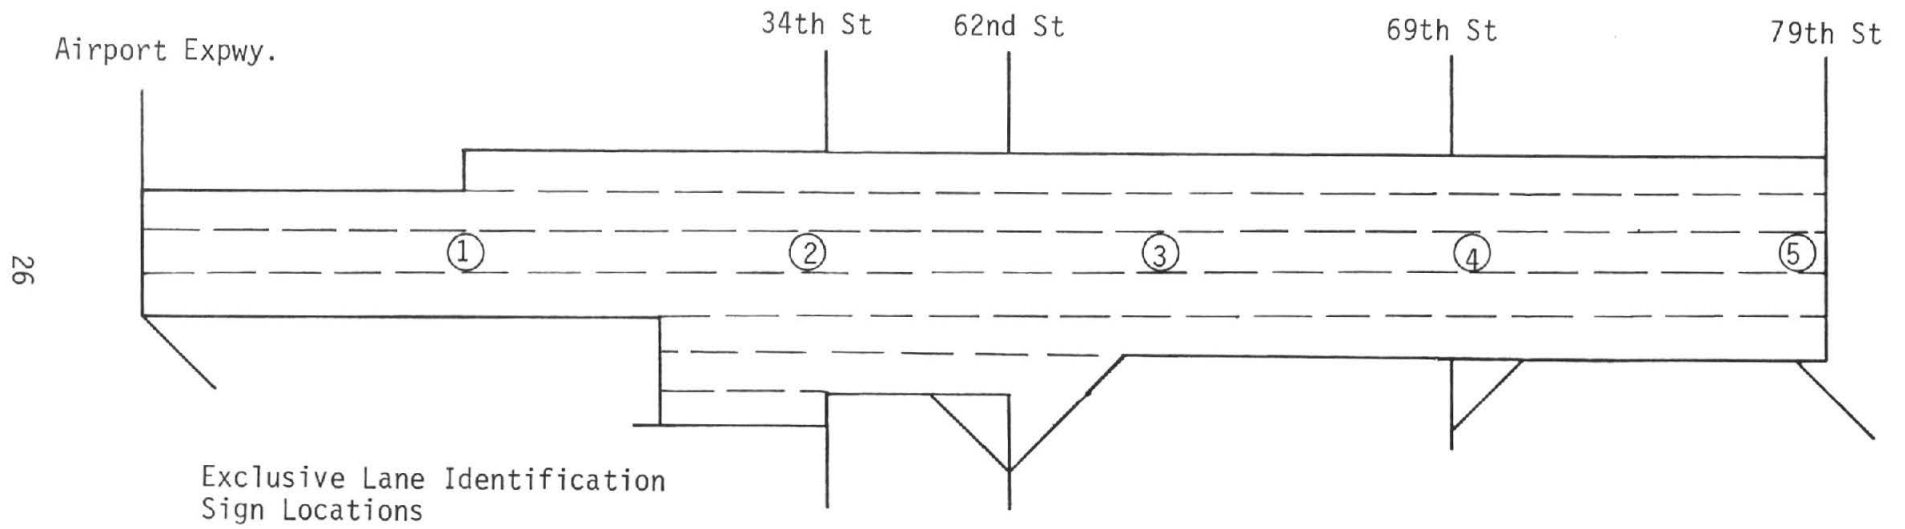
NORTHBOUND (PM) TEST SECTION FOR SIGNING AND PAVEMENT MARKING STUDIES.
